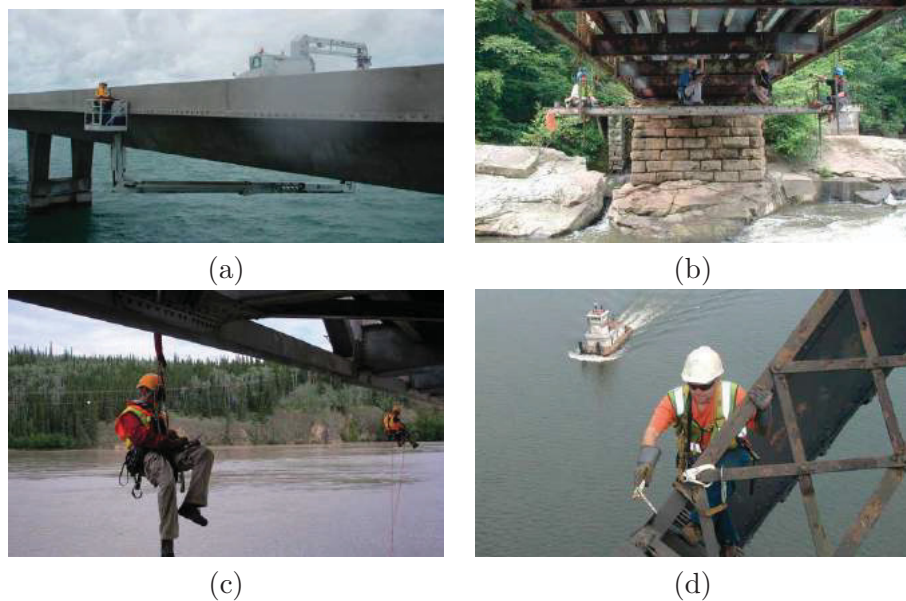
Traditional methods of inspection place workers at risk. (a) Boom suspends worker for understructure inspection (b) Floats suspended below bridge deck as platform for workers (c) Multiple climbers suspended along bridge length to inspect beneath bridge decking (d) Climber operating tool with one hand and holding on to structure with other.
